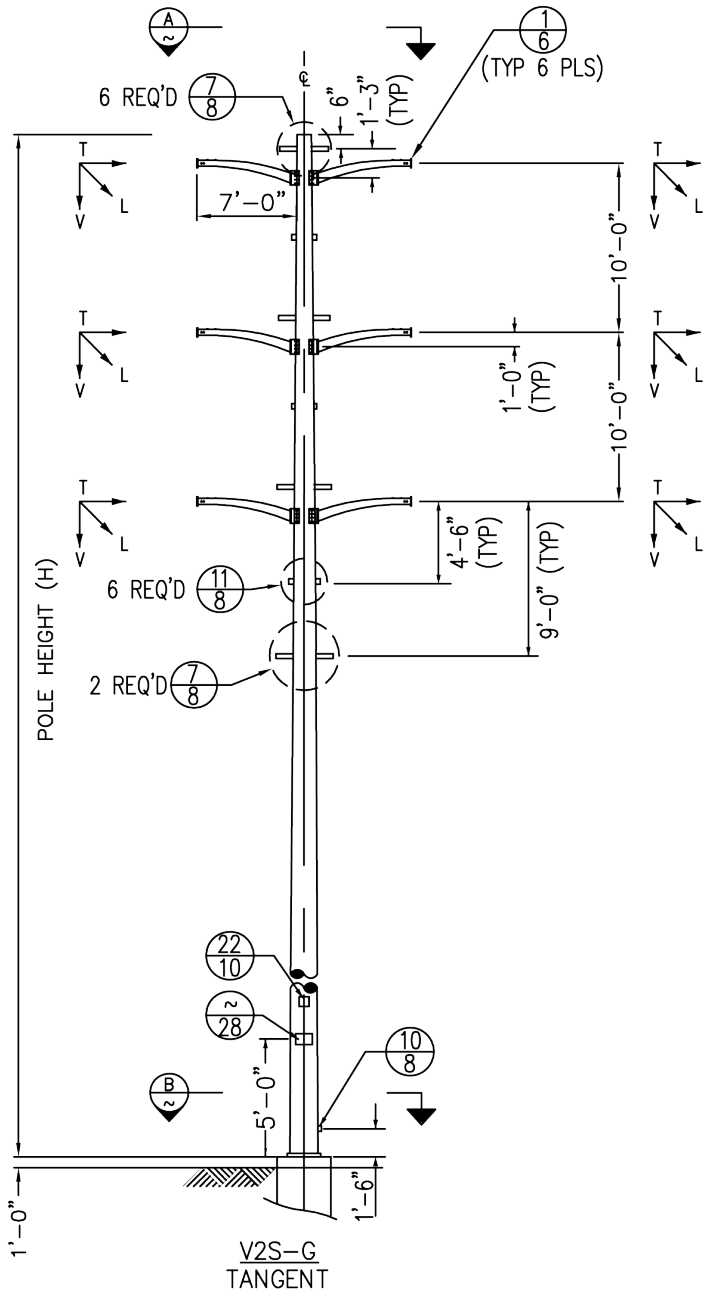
Typical Tubular Steel Pole Drawing - Concrete-Pier Foundation
